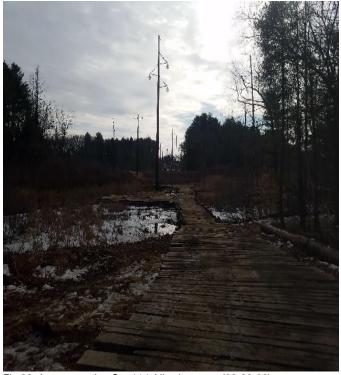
Access road to Str. 114. Viewing east. (02-26-20).
